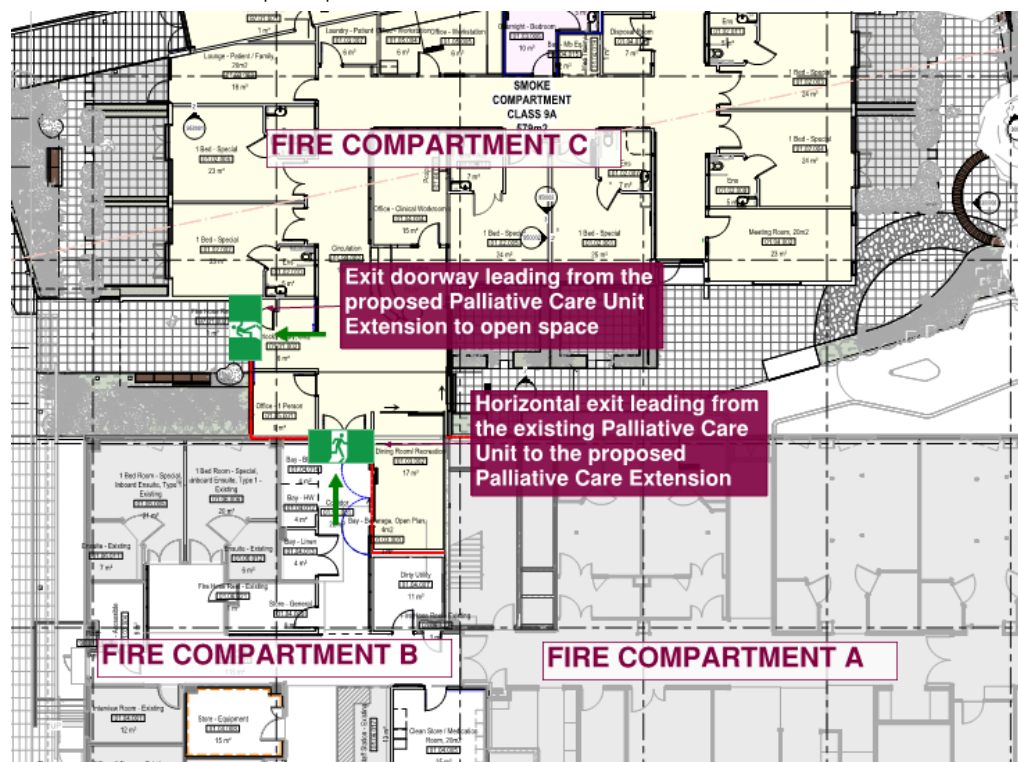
Modified egress arrangement where travel via the horizontal exit serving Fire Compartment A has been impacted
